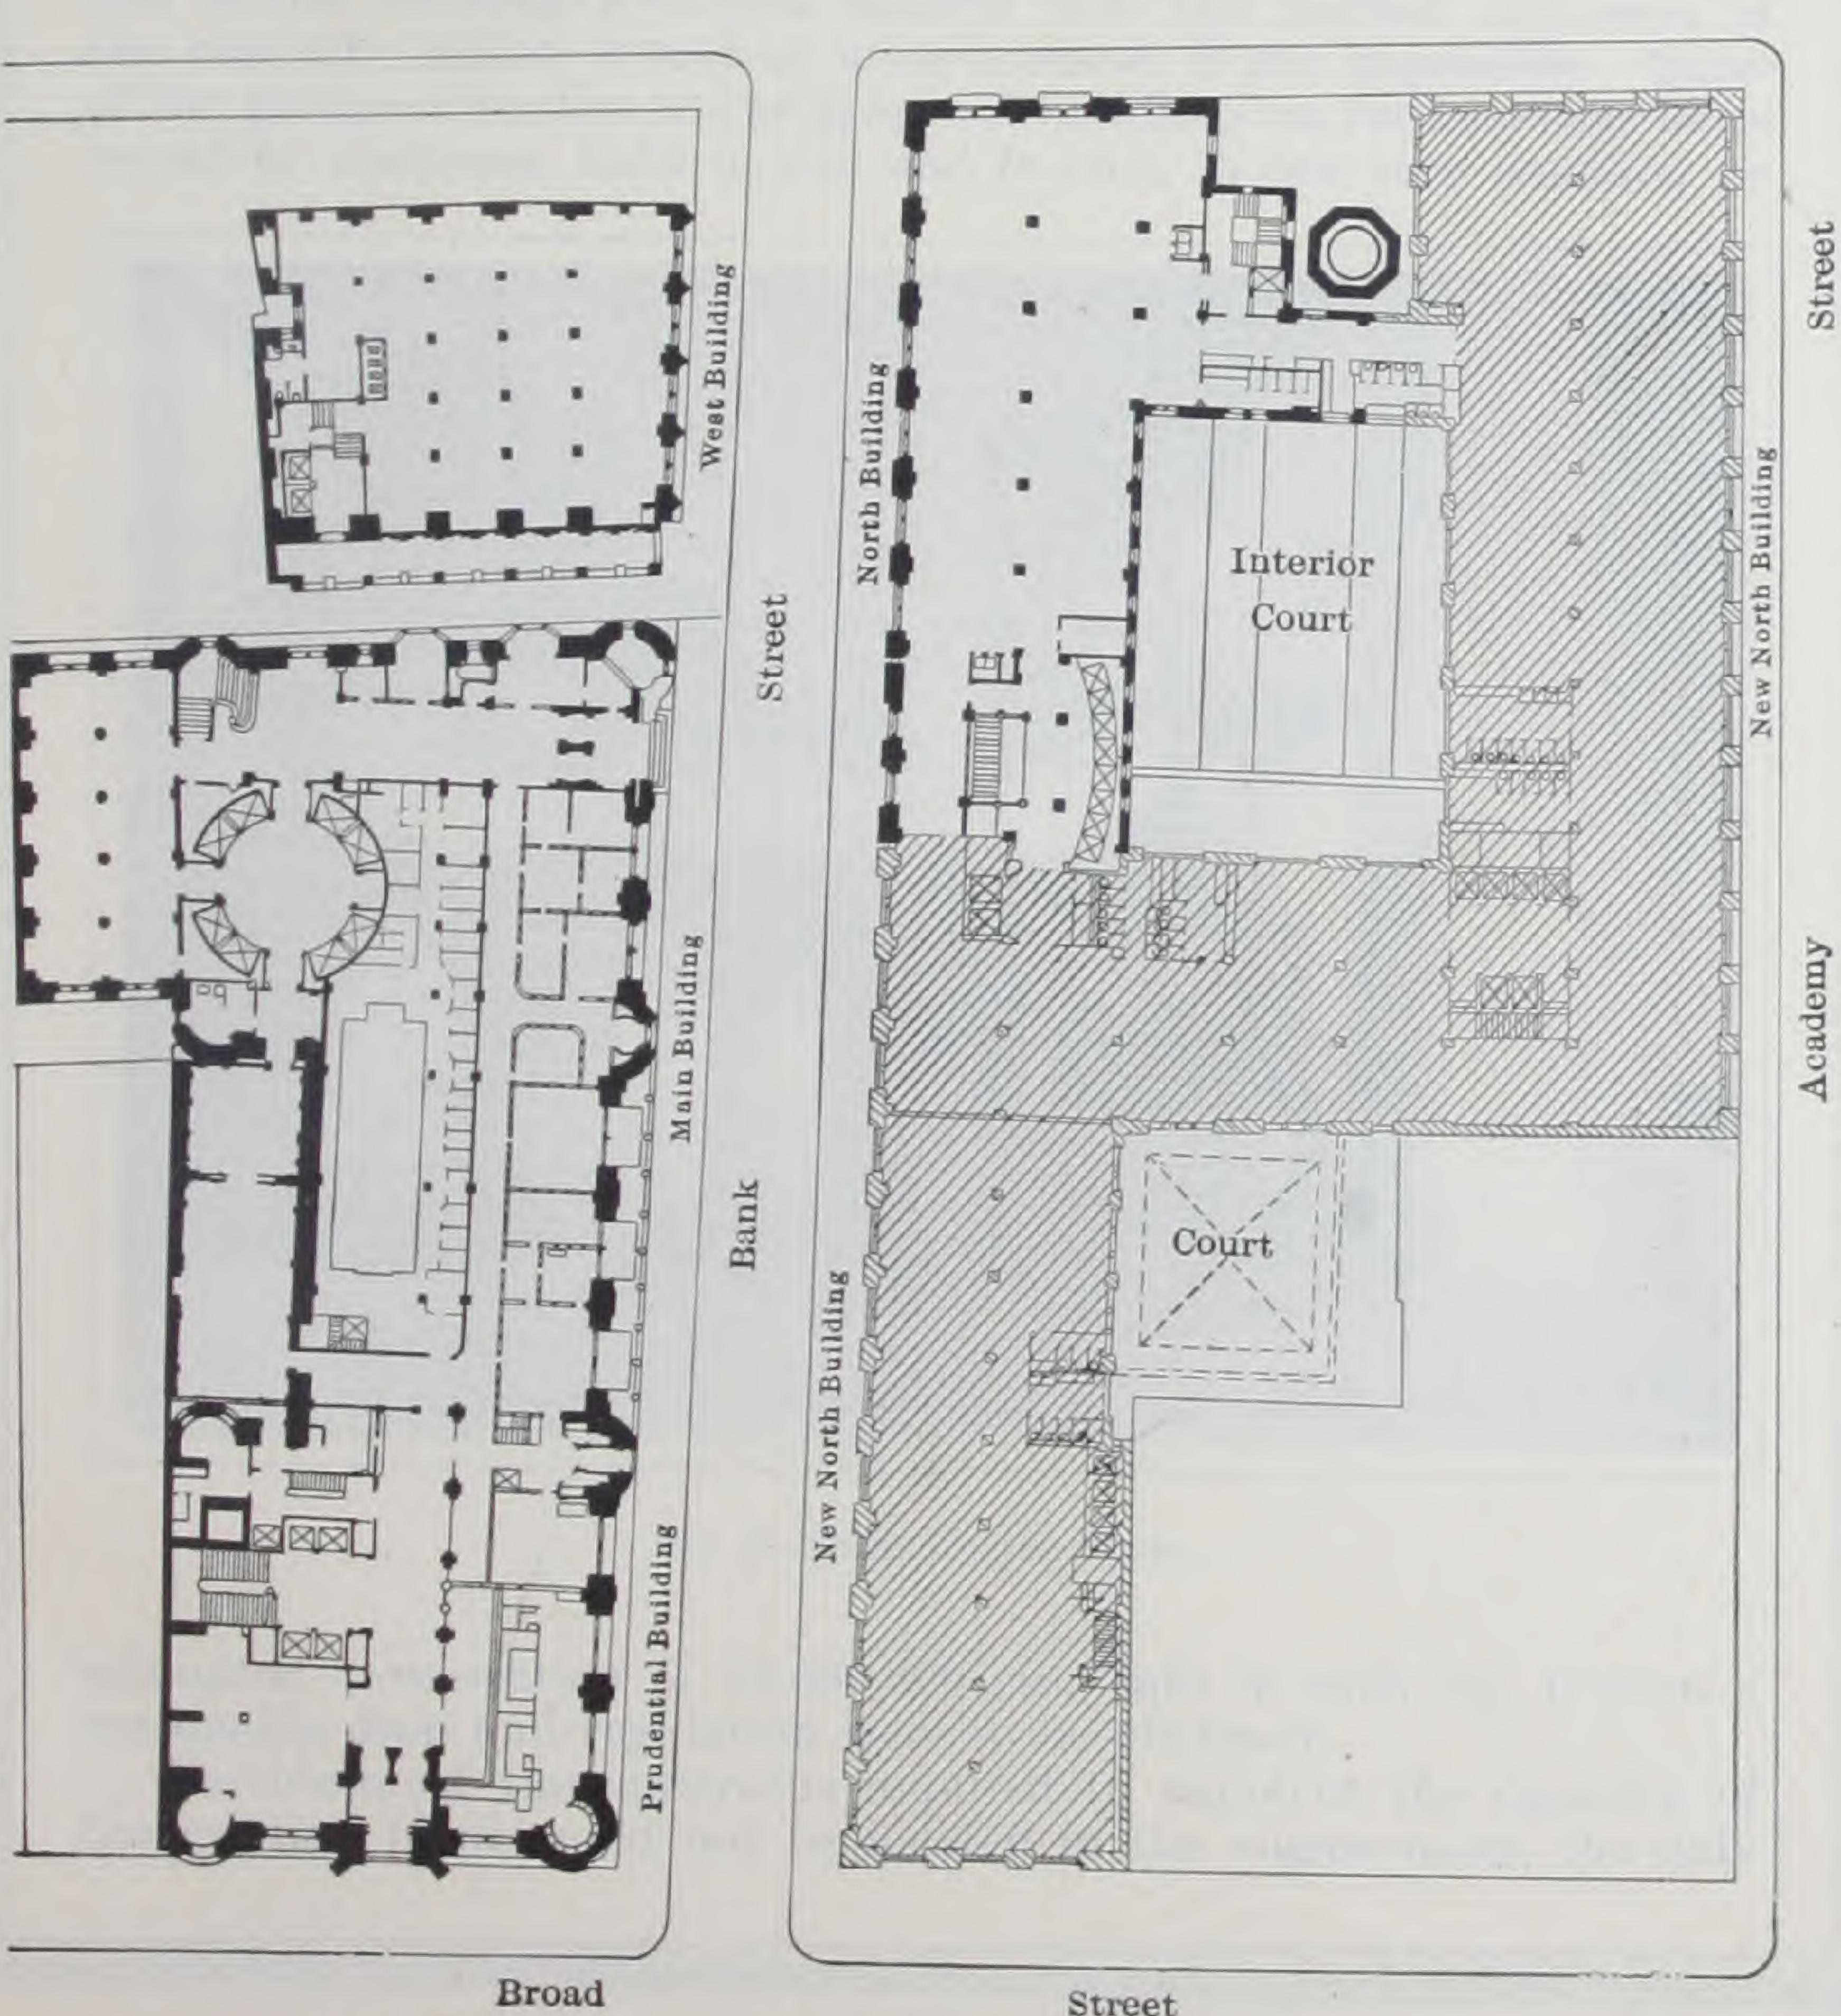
General Plan of the Buildings of Prudential Insurance Company
